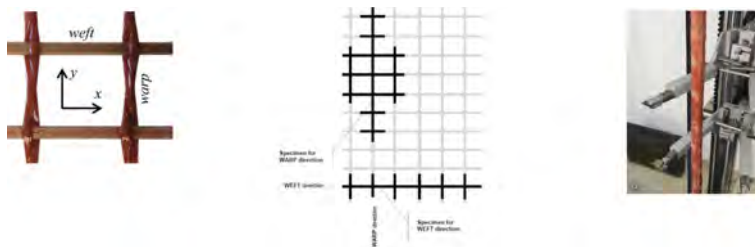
GFRP grids and geometry of the tensile specimens - GFRP rebar connector.
